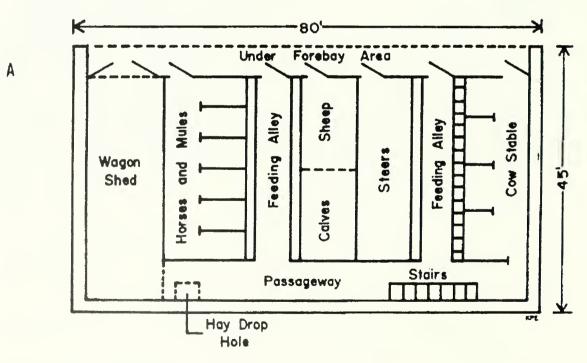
Typical lower level plan of a mid-nineteenth century Pennsylvania Barn. Note: the Mumma Barn differs slightly from this plan.
